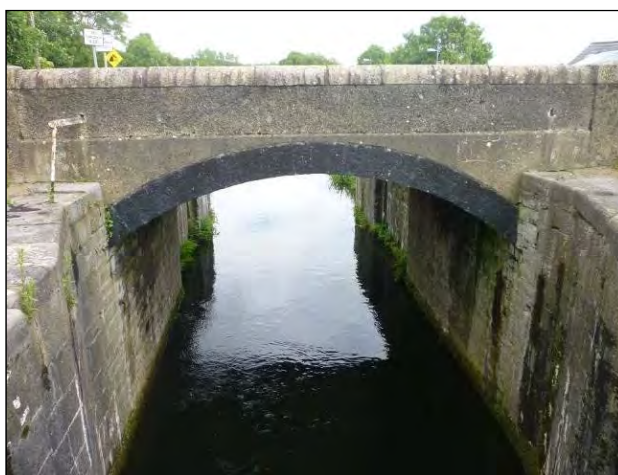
Original arch, west side of Leck Bridge, c. 1770
